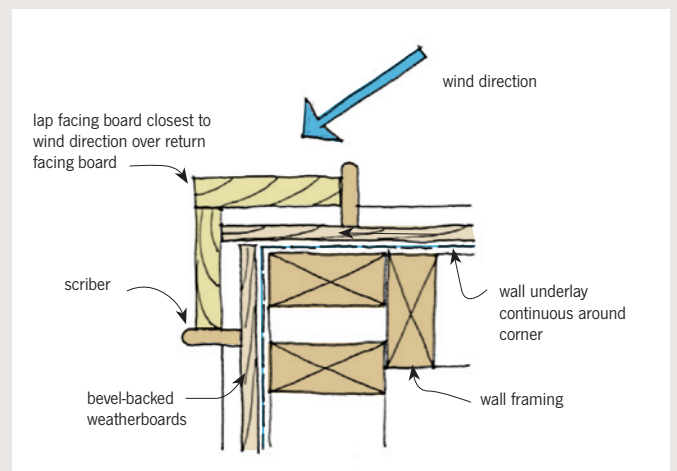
Lapping boxed corners (detail similar for cavity installations).
